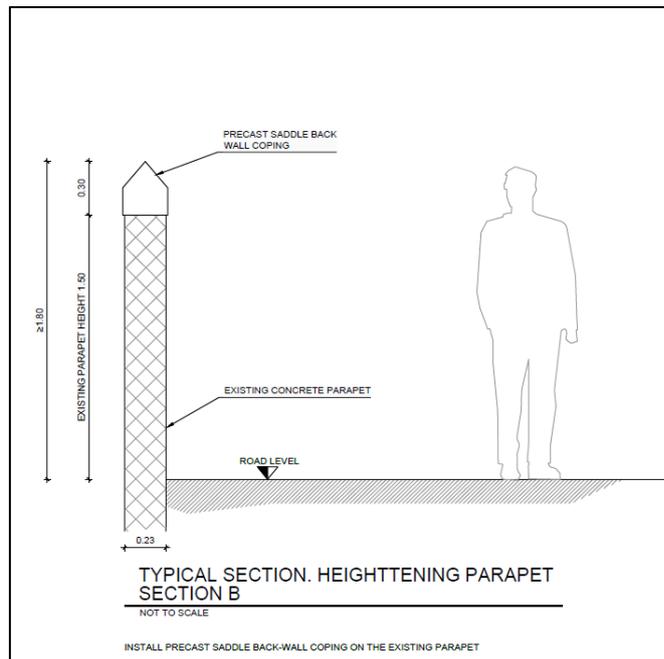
Proposed parapet increase in Bailey's Bridge (OBG24)
